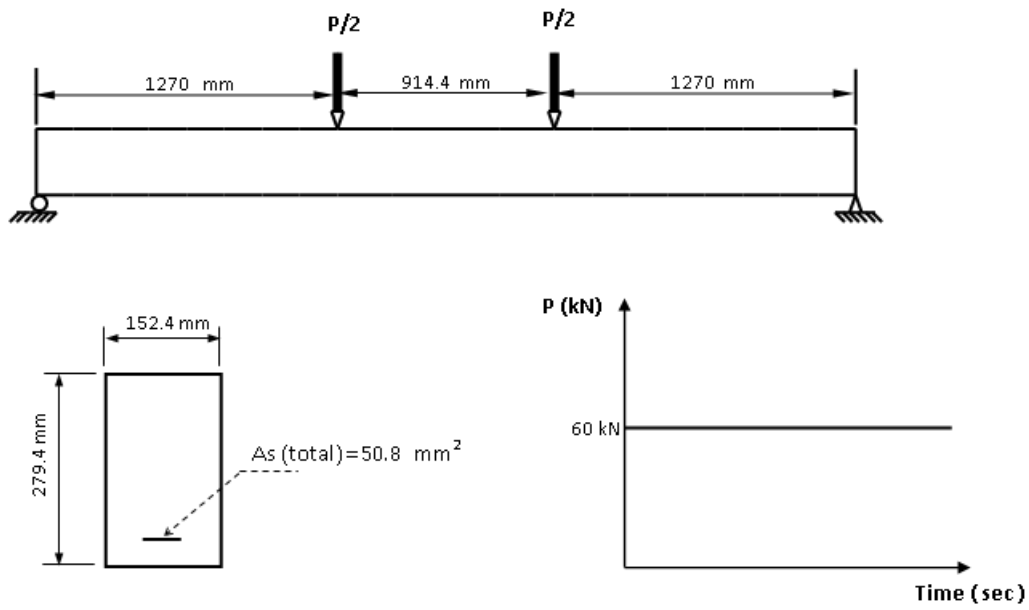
Geometry ,loading and reinforcement details for reinforced concrete beam under step load
